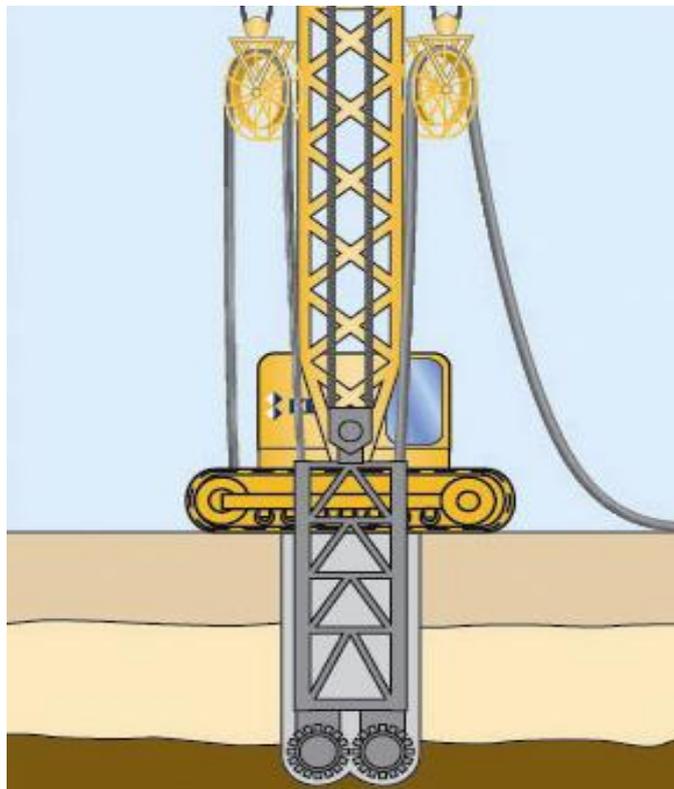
Hydro cutter machines for Diaphragm wall excavation
